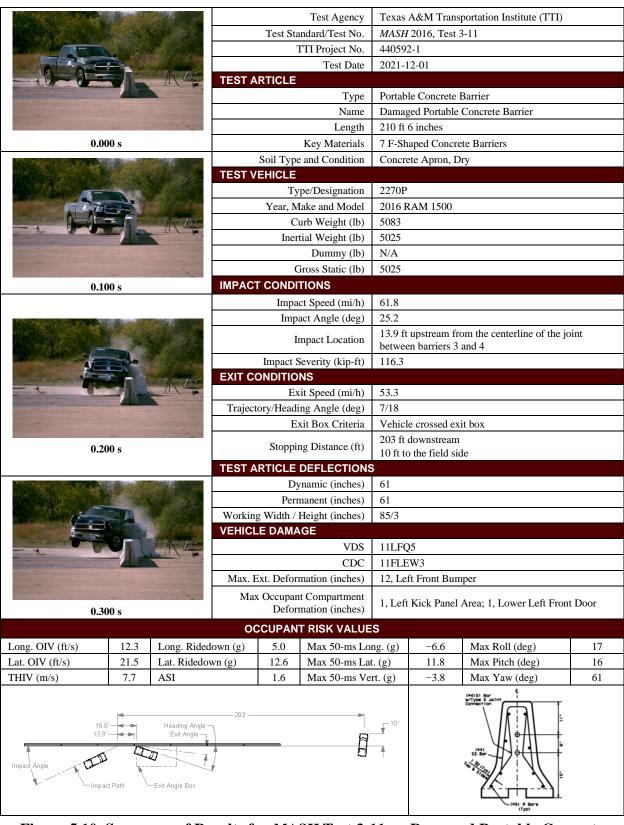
Summary of Results for *MASH* Test 3-11 on Damaged Portable Concrete Barriers, Test No. 440592-1.
